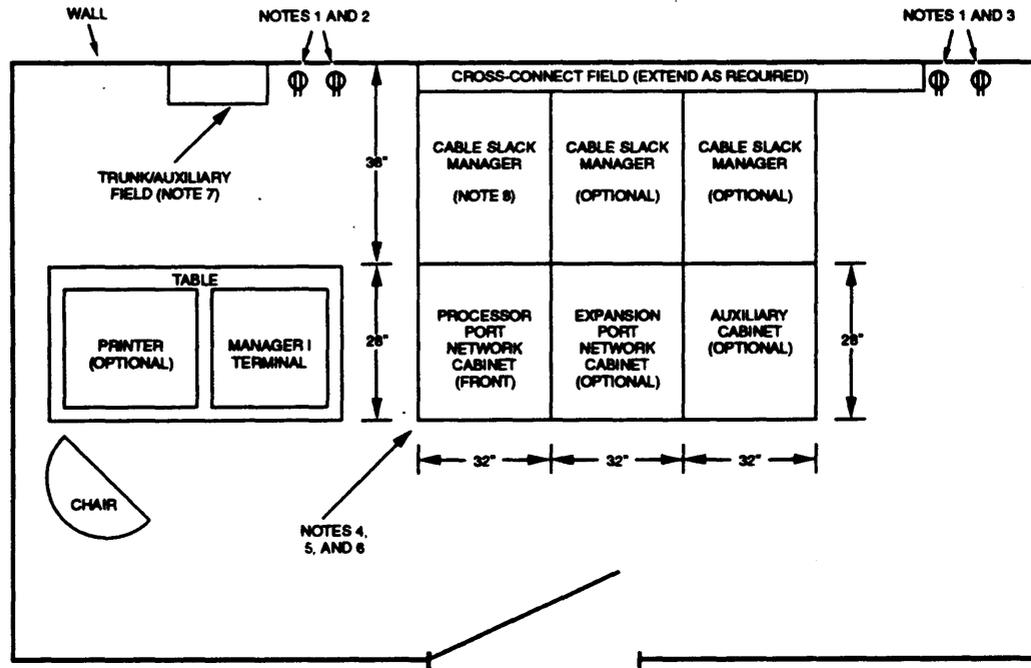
Typical Single-Carrier Cabinet Floor Plan
